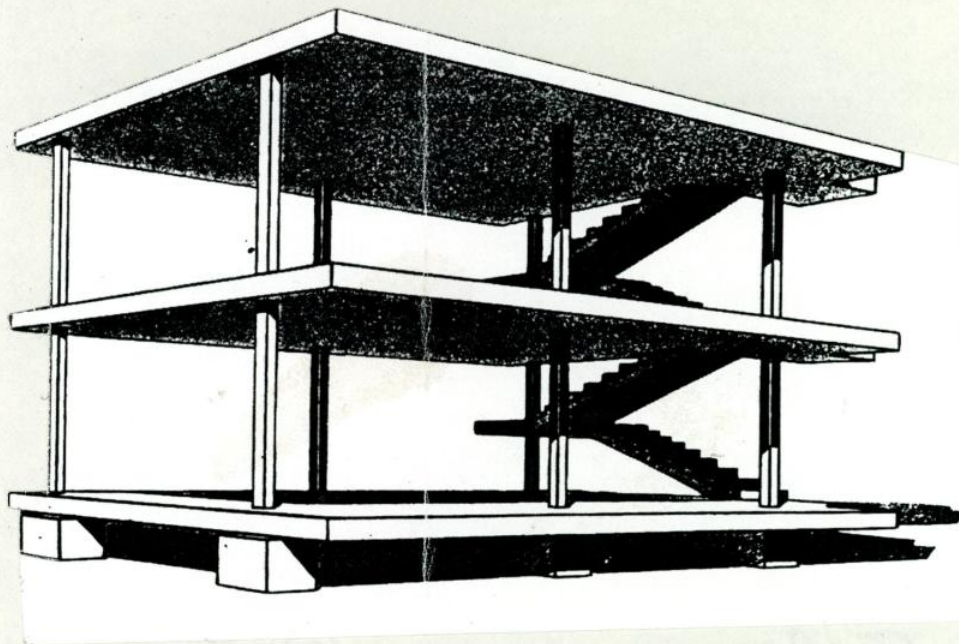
The reinforced concrete structural framework of the Domino Houses, planned by Le Corbusier in 1918.
